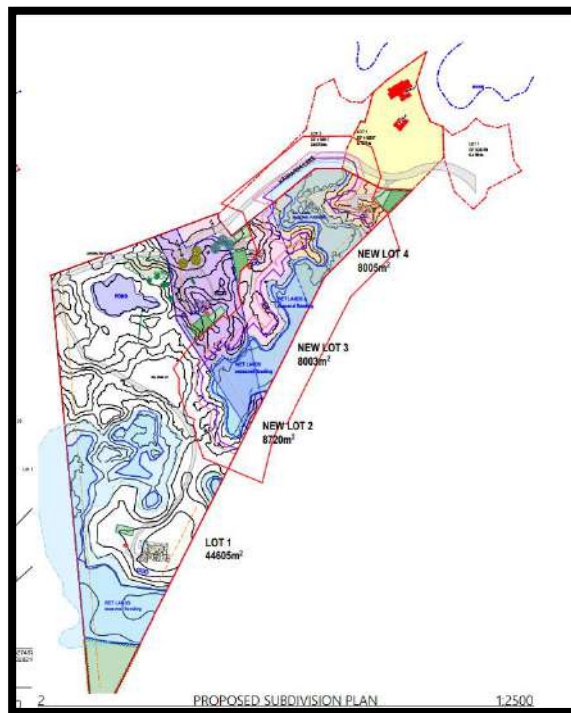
Subdivision Plan – 44 Hauparua Lane, Kerikeri
